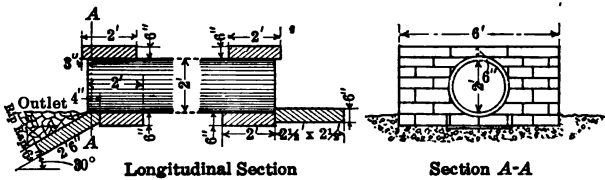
Missouri Pacific Railroad Protection for Tile Culvert.
